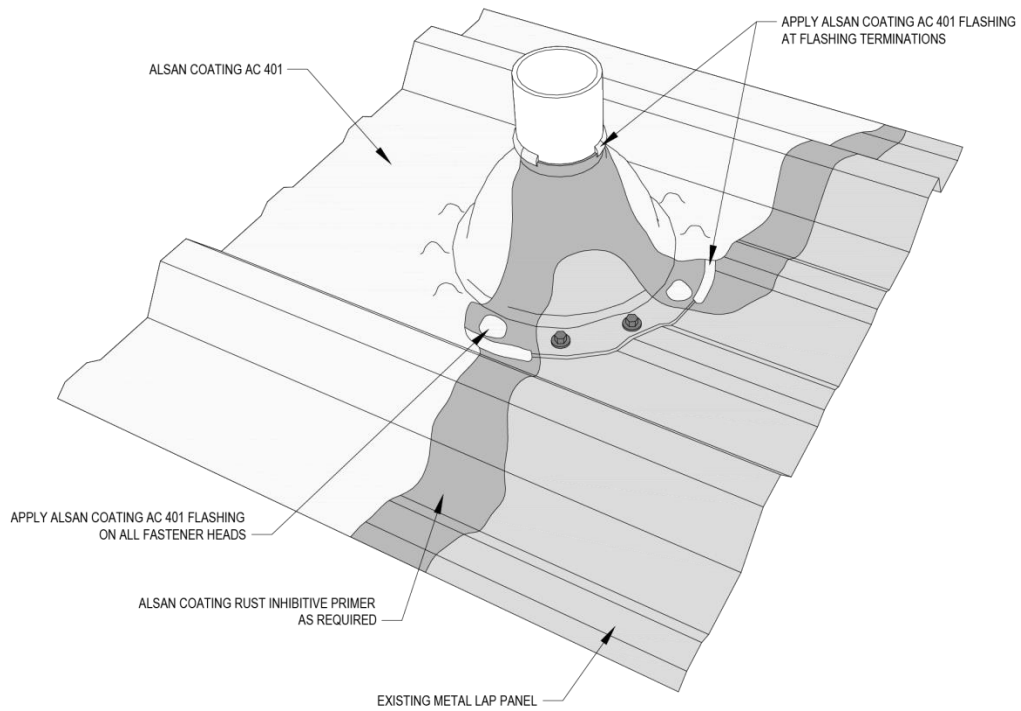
Acrylic Roof Coating Over Metal Lap Panels, Penetration
